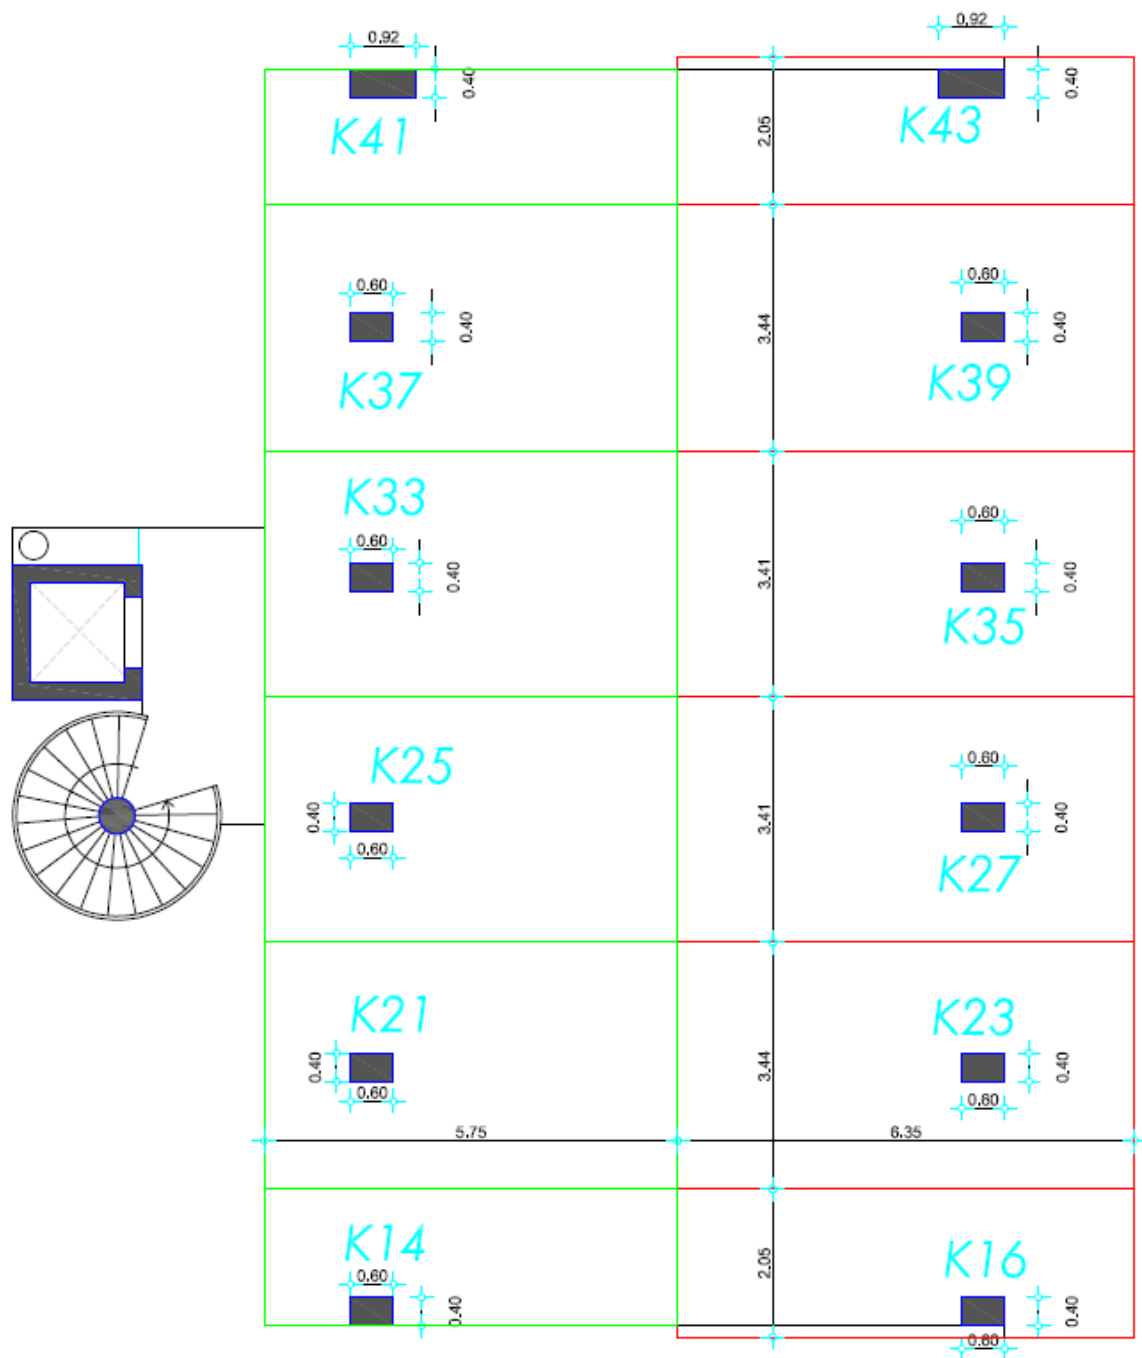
Typical floor plan with the columns numbering and dimensions at their base
